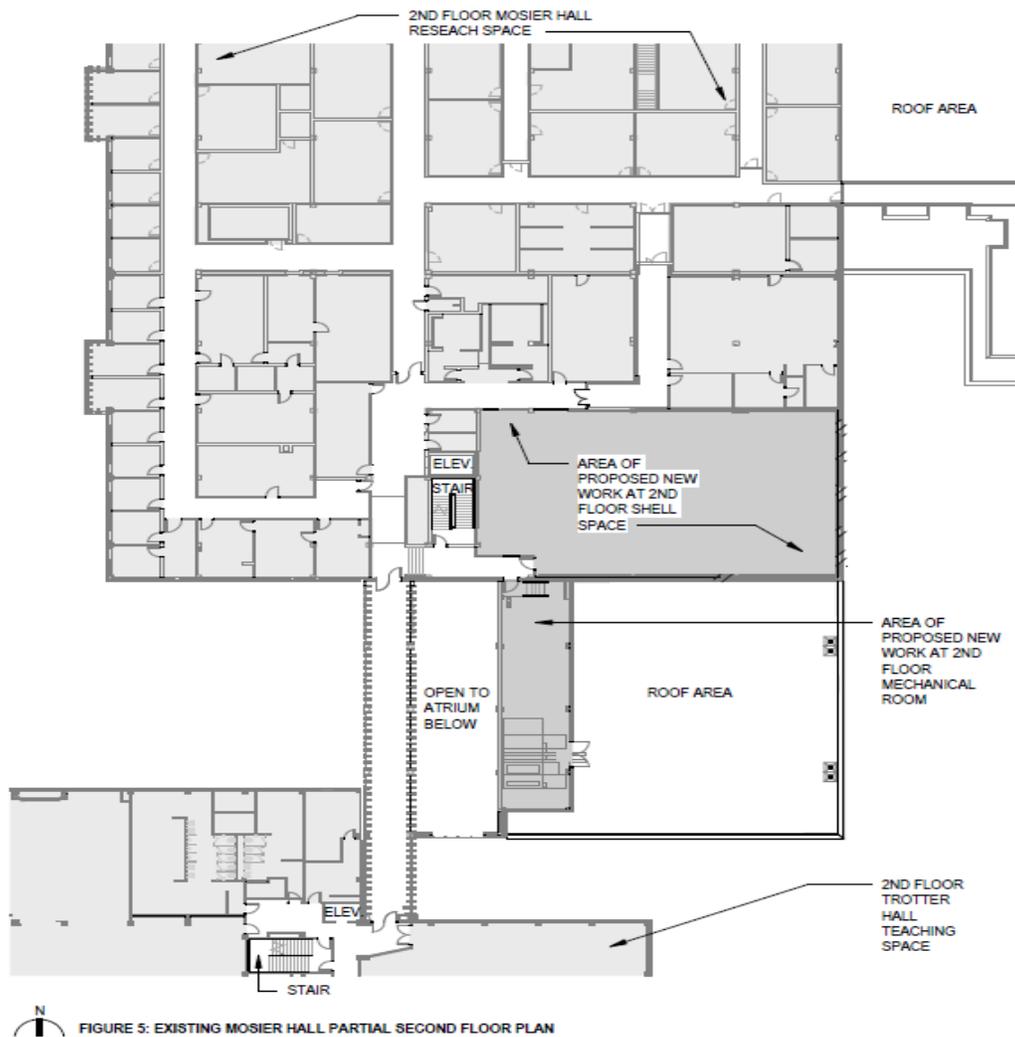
EXISTING MOSIER HALL PARTIAL SECOND FLOOR PLAN
